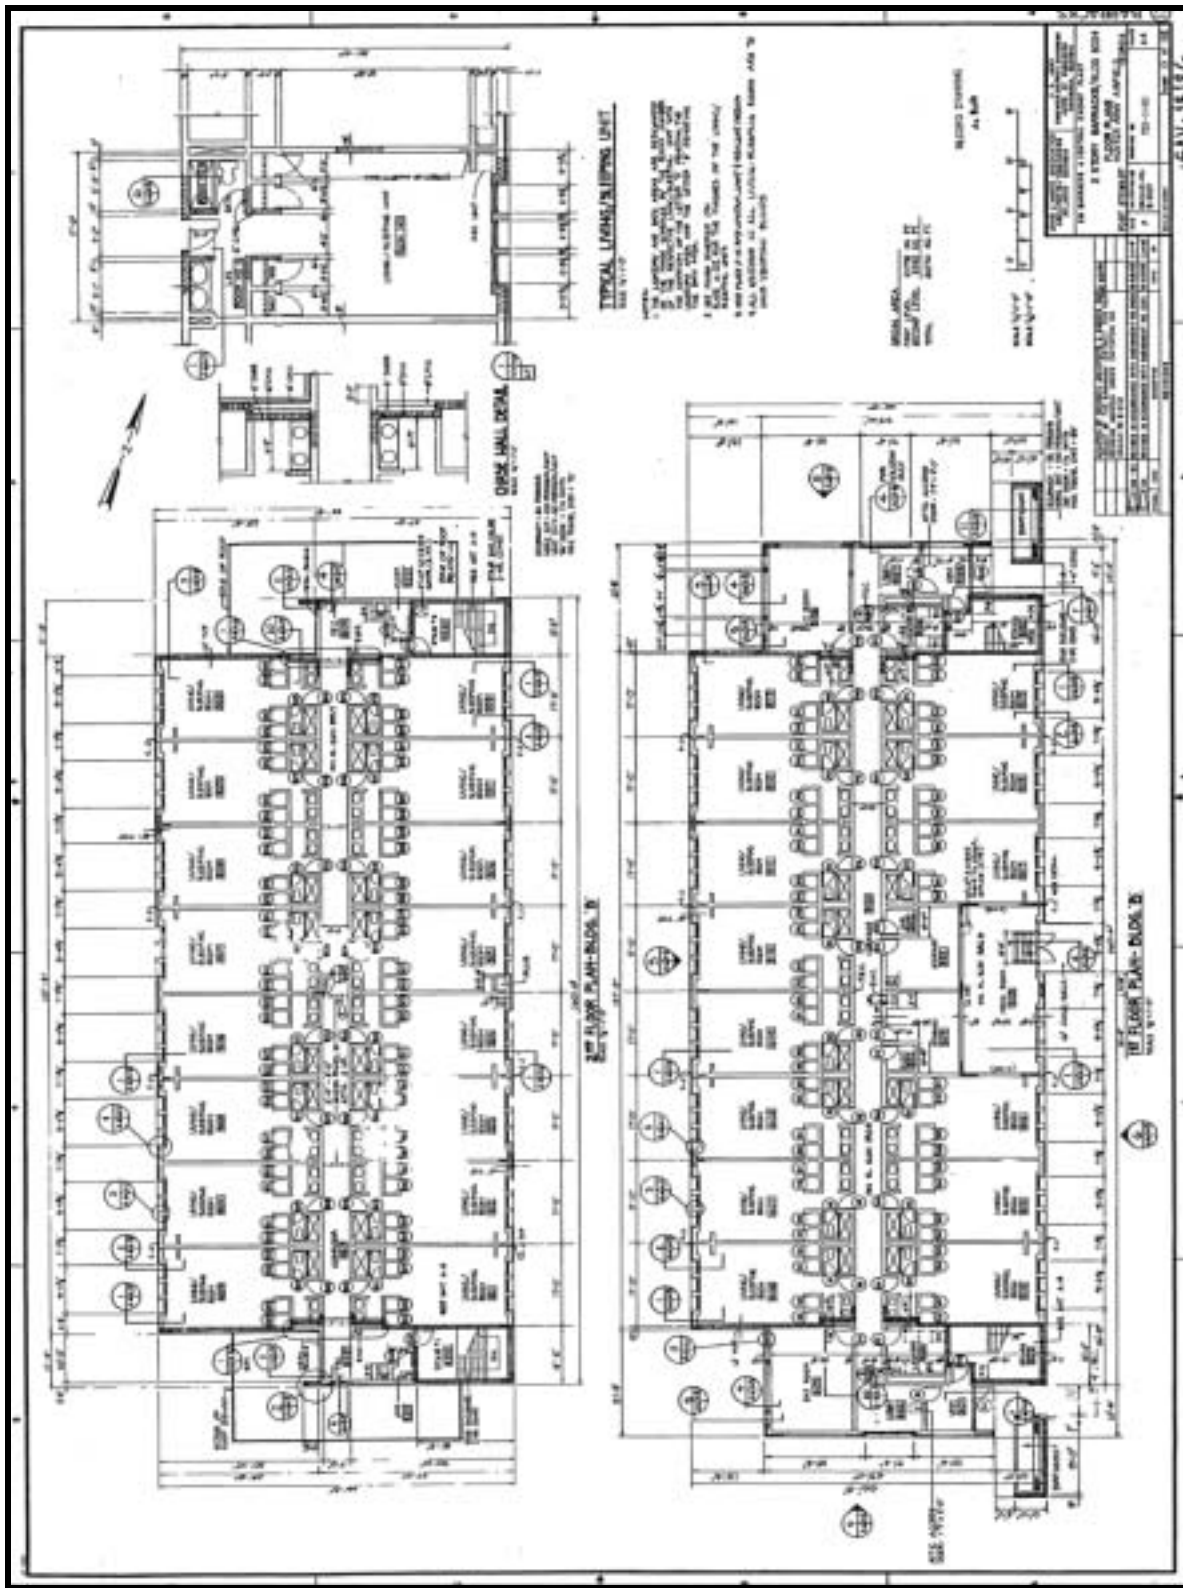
Single Quadrangle barracks, floor plans, Ft. Stewart (1983, revised 1984) (Engineering, Ft. Benning).
